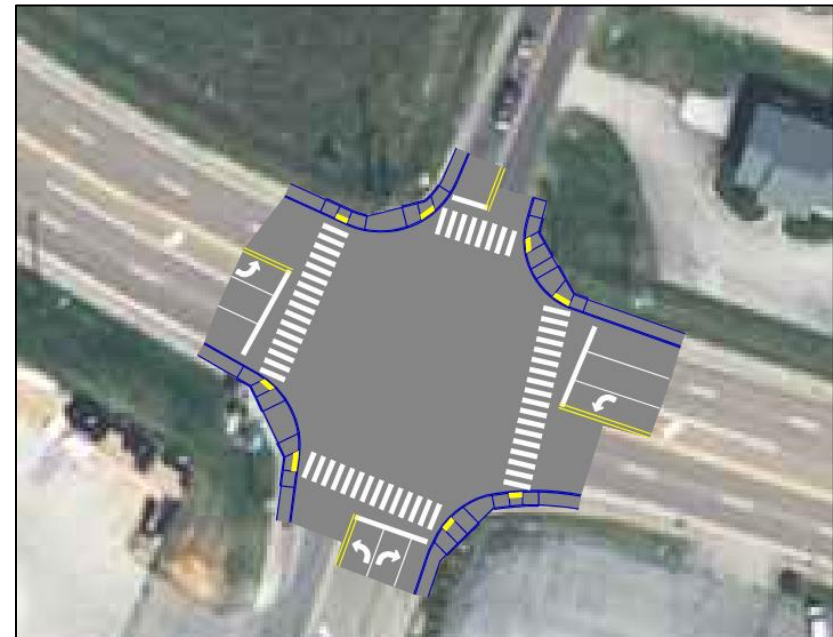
SR 92 at Russell Avenue Long-Term Improvement
